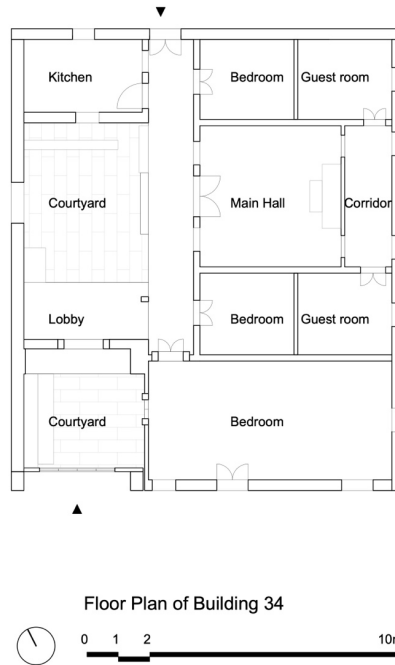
Floor plan of the ancient house at No. 34, Shatang Li, Aotou Village. (Source: Author, 2024).
